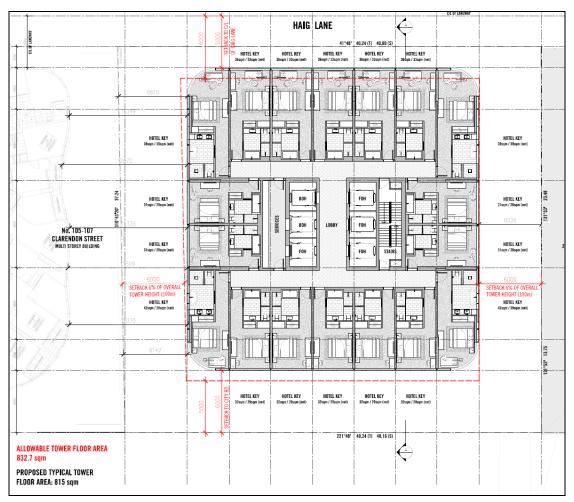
Discussion Plans (13 July 2021) showing an adjusted floorplate
